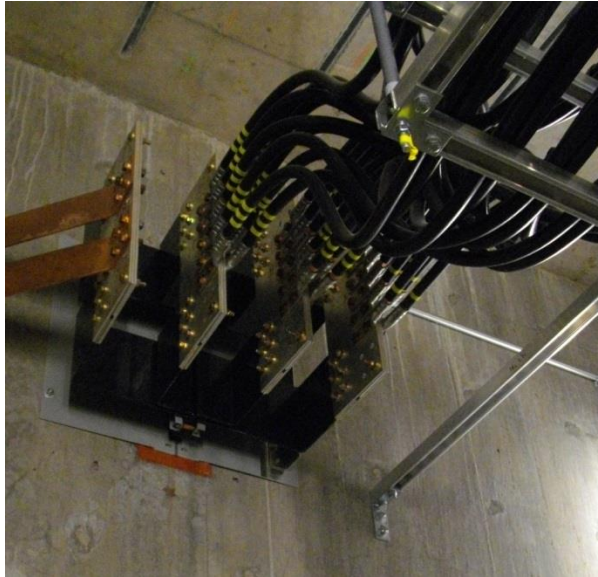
Bus Bars Perpendicular to Floor, Plan View
